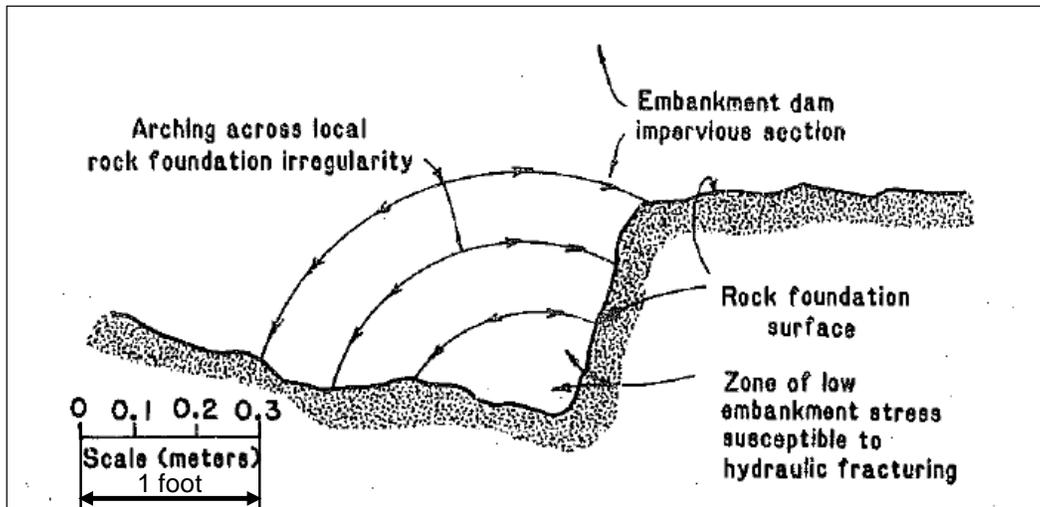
B-6. Cracking and Hydraulic Fracture due to Small-Scale Irregularities in the Foundation Profile (Sherard 1985b)
